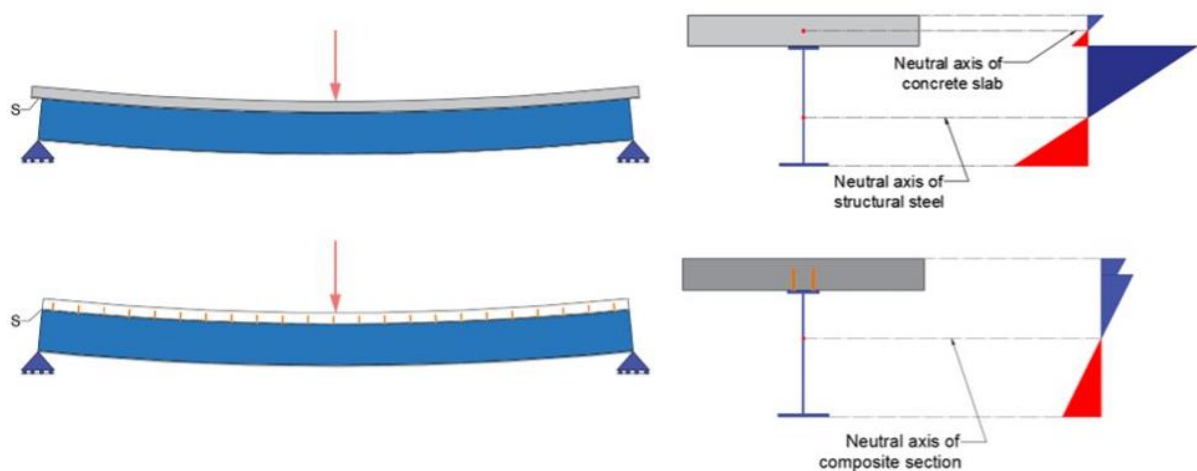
Girders in flexure with and without full shear connection, redrawn from (Vayas & Iliopoulos, 2014)
